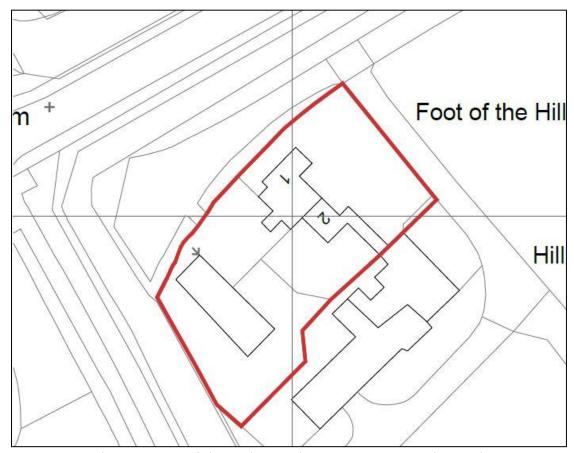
Site Plan (Courtesy of client) showing barn (MME20590) to the southwest
